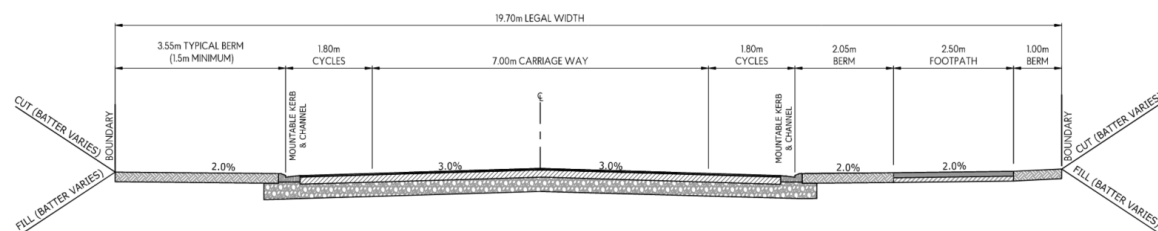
Typical Cross-Section (C) Collector - 19.7m with Cycleway
